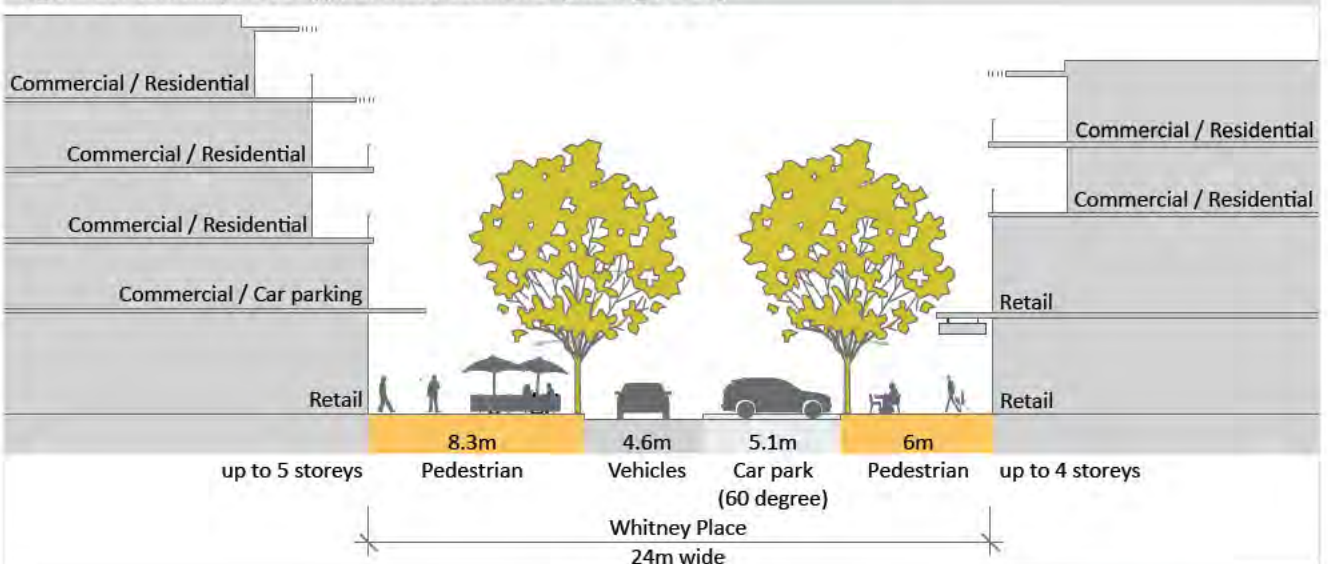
Whitney Place typical cross-section C (See Figure 37)
